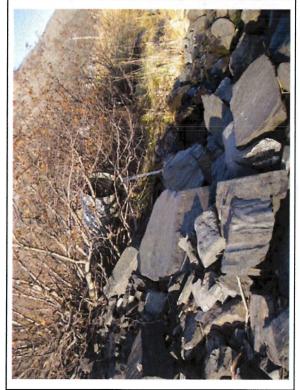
Outfall pipe in Historic Artifact Debris area (P-28) near 168+50
